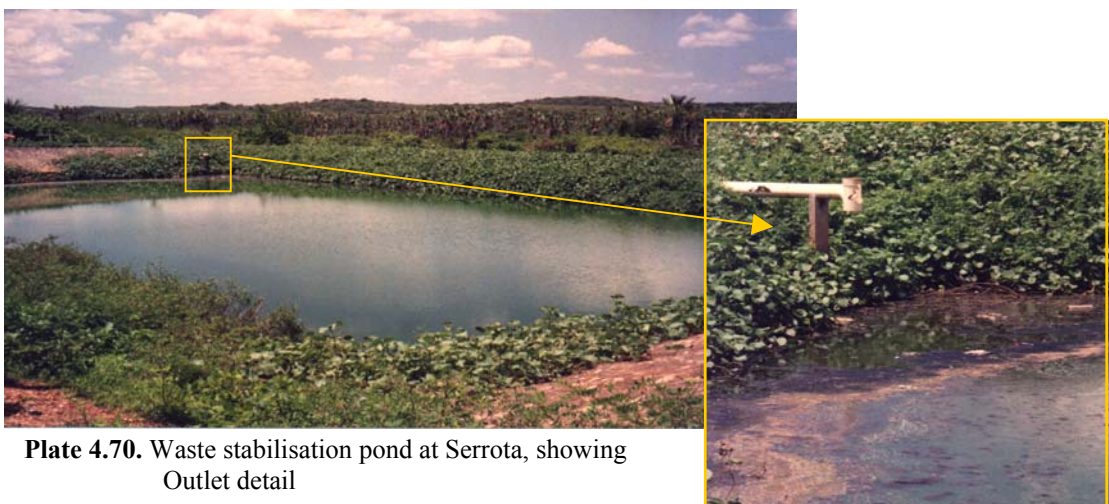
Waste stabilisation pond at Serrota, showing Outlet detail
